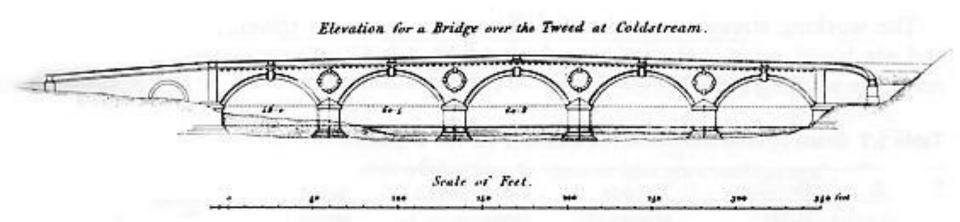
Elevation of masonry Bridge over the Tweed at Coldstream, 1866 (Irwin and Sibbald, 1983)
